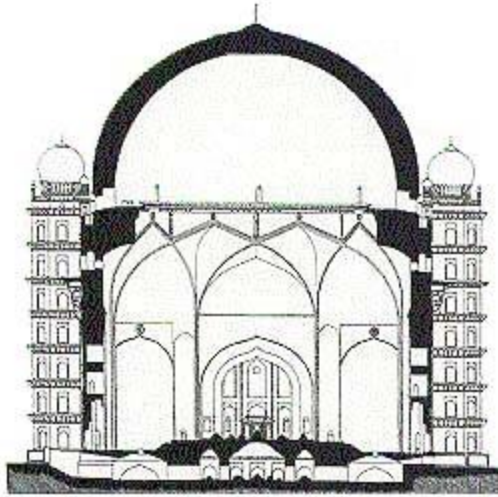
Cross section of Gol Gumbaz in Bijapur, India, 1659
